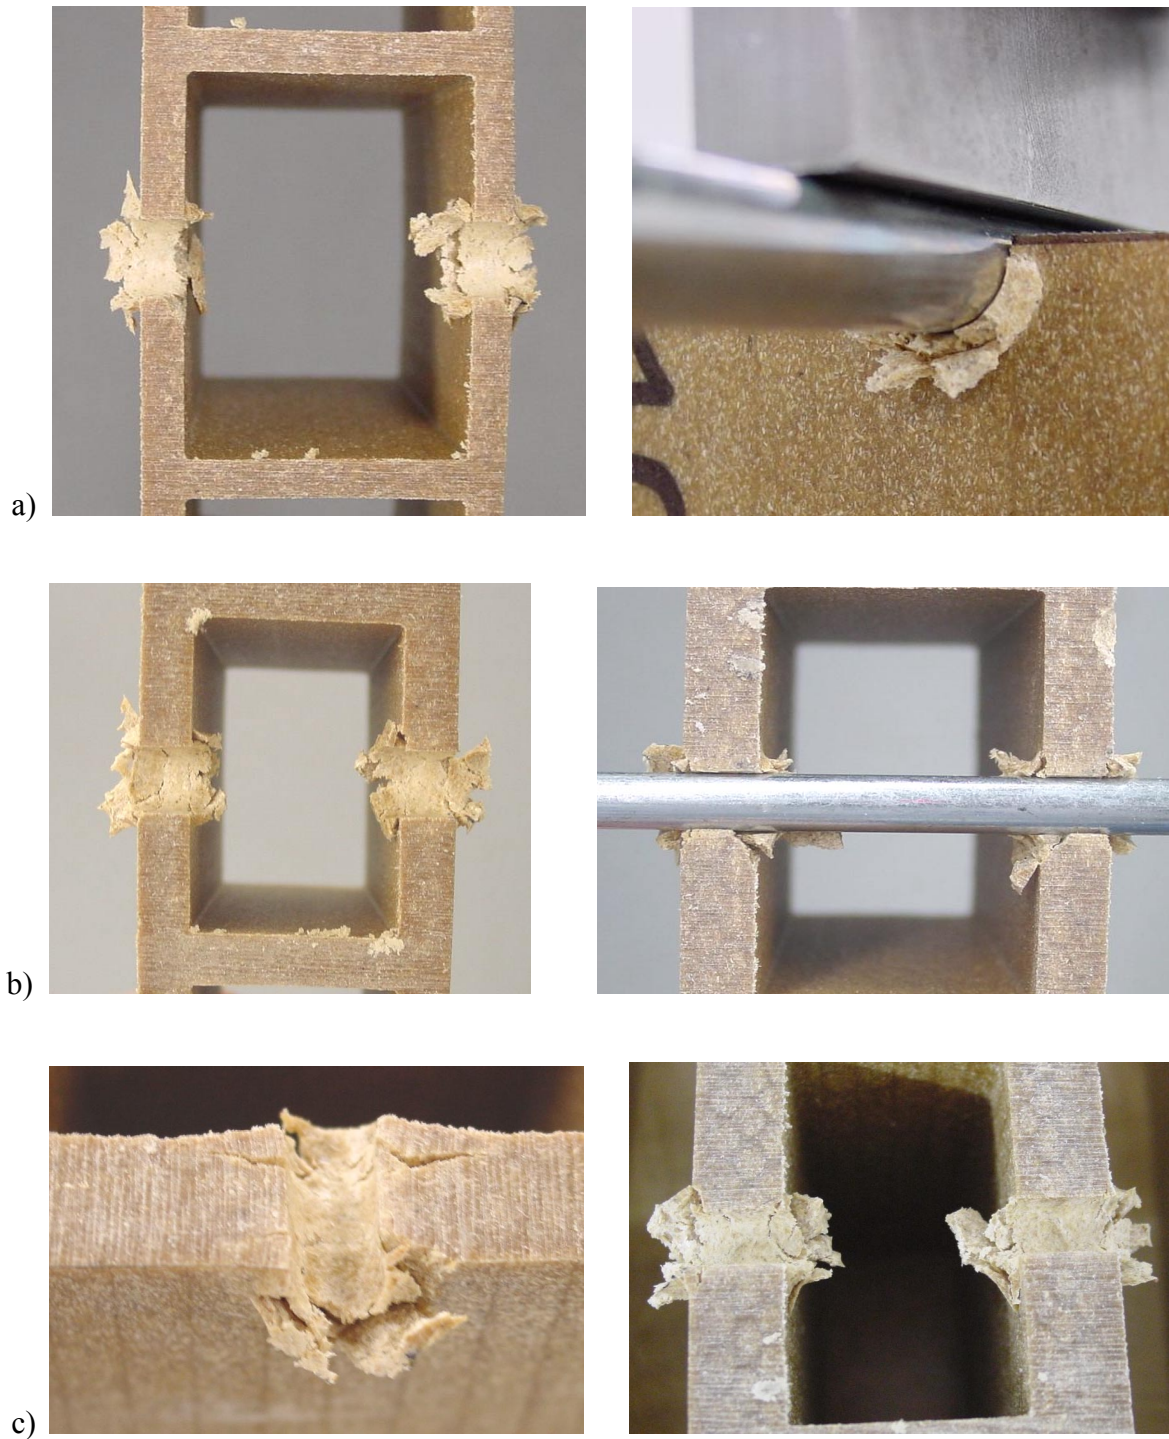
Typical PVC dowel bearing failures: a) 0.2" wall b) 0.3" wall c) 0.4" wall
